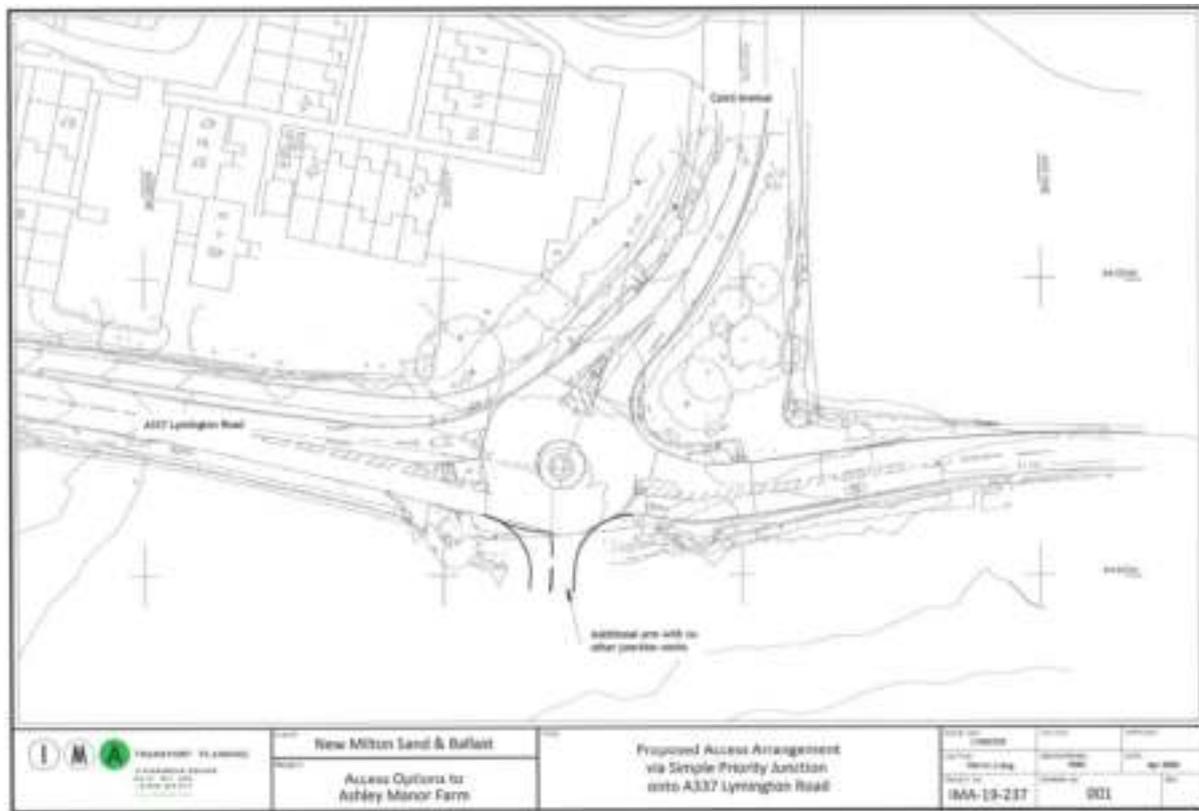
Proposed site access to NFD01 off the A337 Lymington Road/Caird Avenue Roundabout
